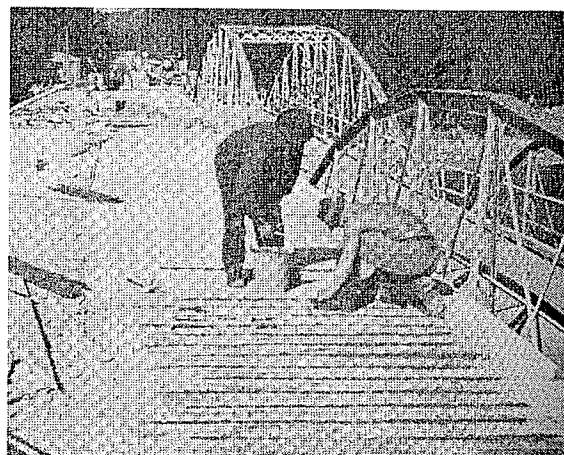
Grouting of deformed bars [Asplund, 1949]
